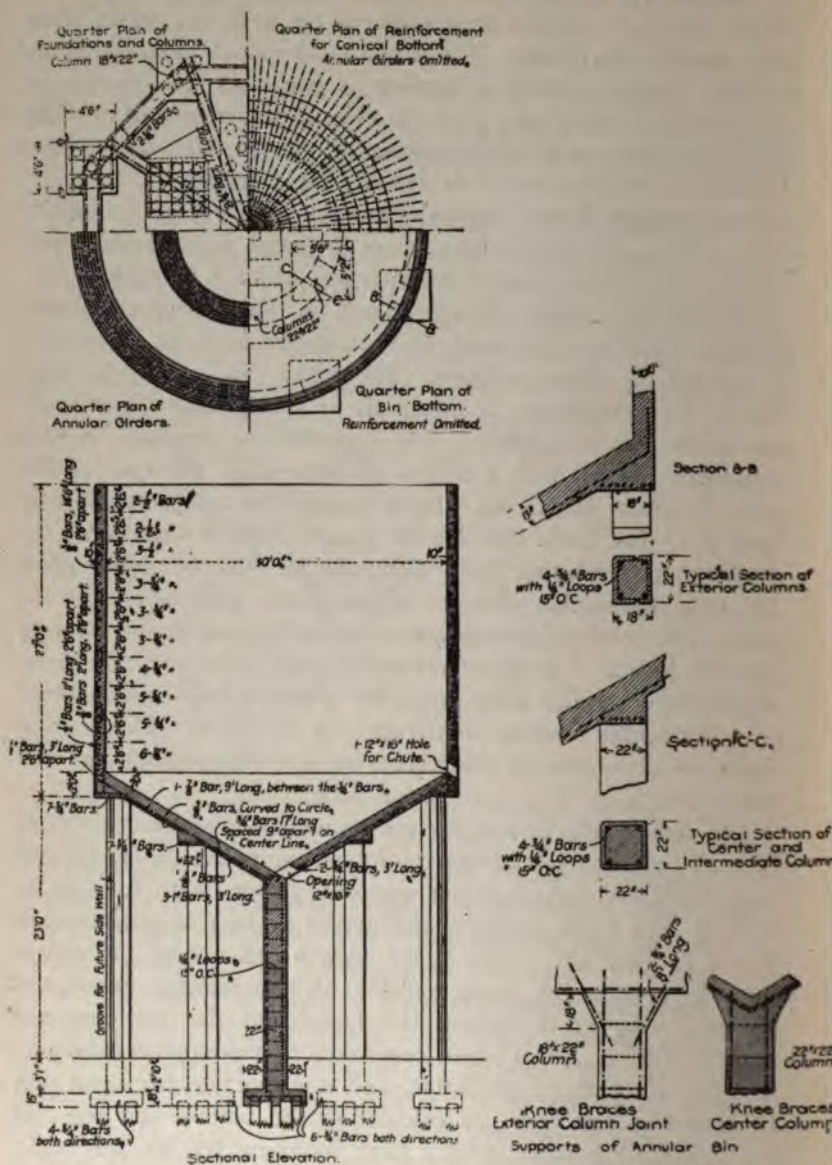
Details of Sand Storage Bins at Hempstead, Long Island.
